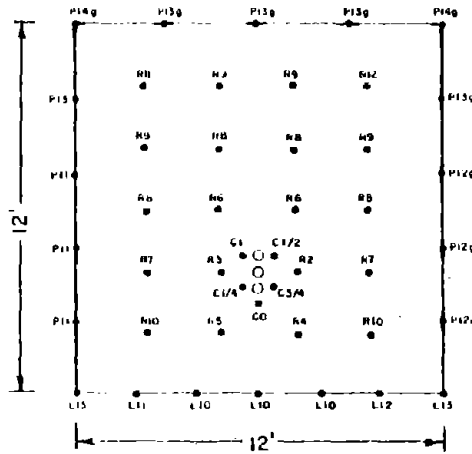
TUNNEL ROUND DESIGN - MSB6/FC CUT 2
